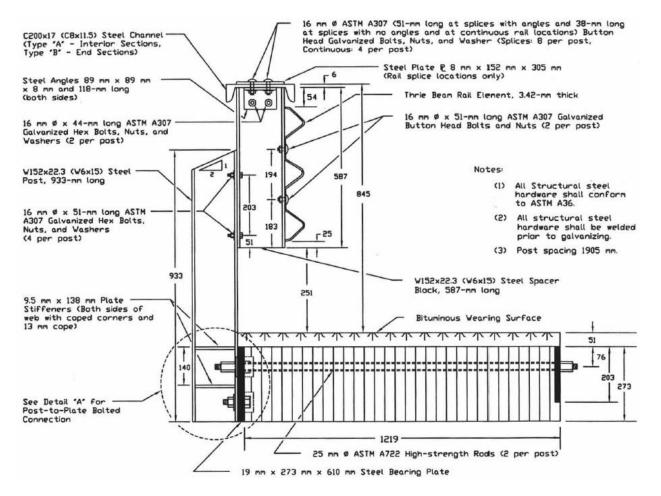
AASHTO PL-2 TBC-8000 Bridge Rail for Longitudinal, Glulam Timber Decks [53]
